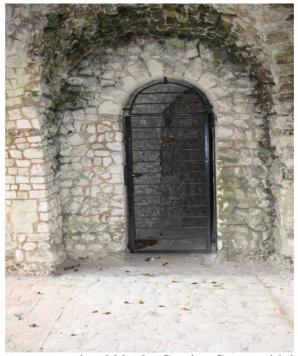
Entrance to tunnels within the Grecian Grotto with bat grill installed
